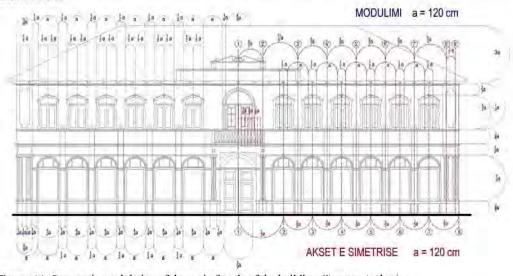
Geometric modulation of the main facade of the building (Source: Author)
